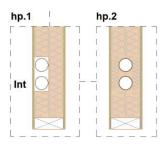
Ventilation ducts positioning hypotesys into timber frame
